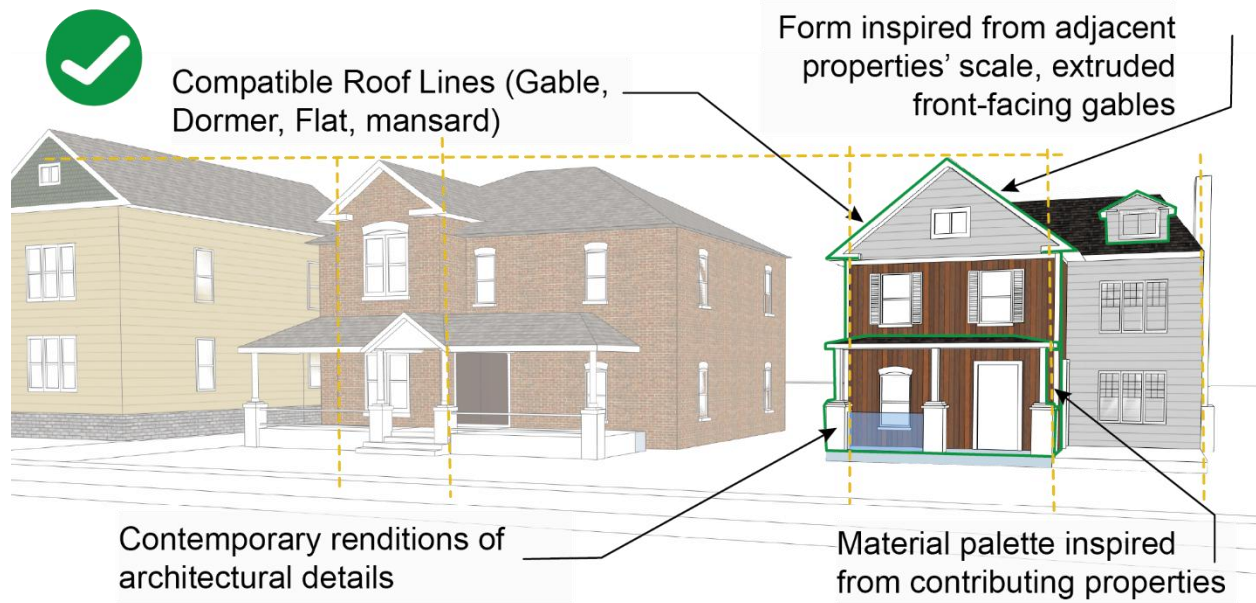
Graphic example of new construction within the District, using form, scale and architectural details as inspiration for new buildings.
